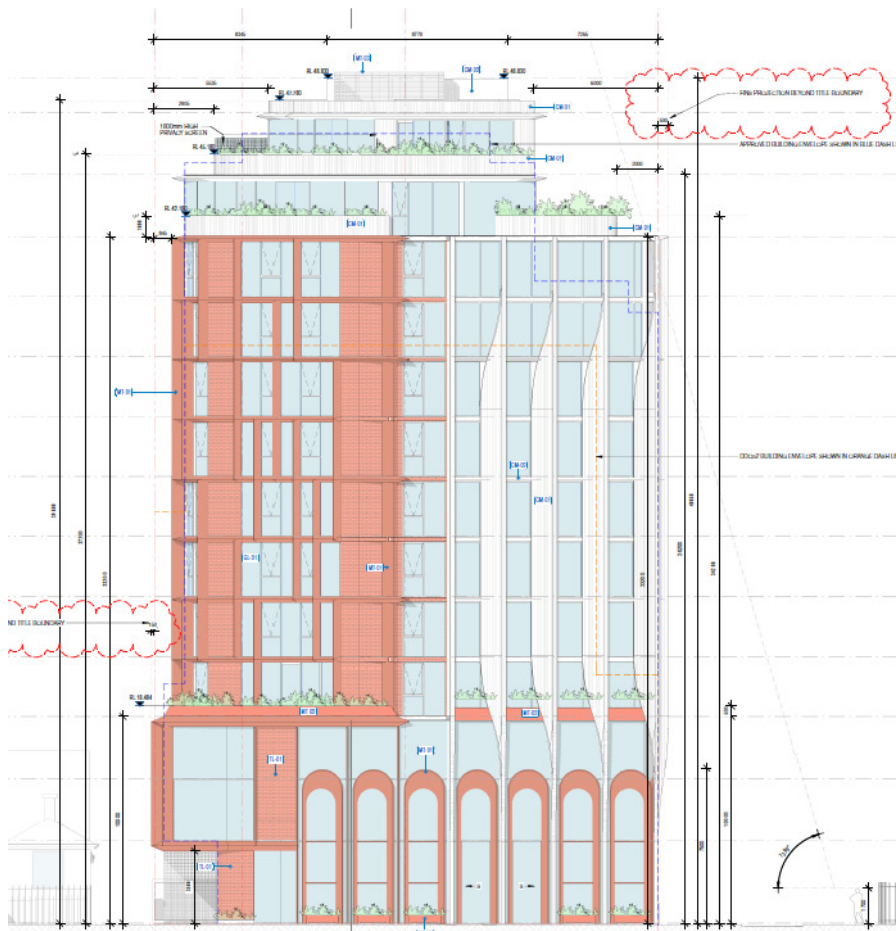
South elevation of the proposal. DDO preferred height hatched in yellow and previous approved building envelope hatched in blue.
